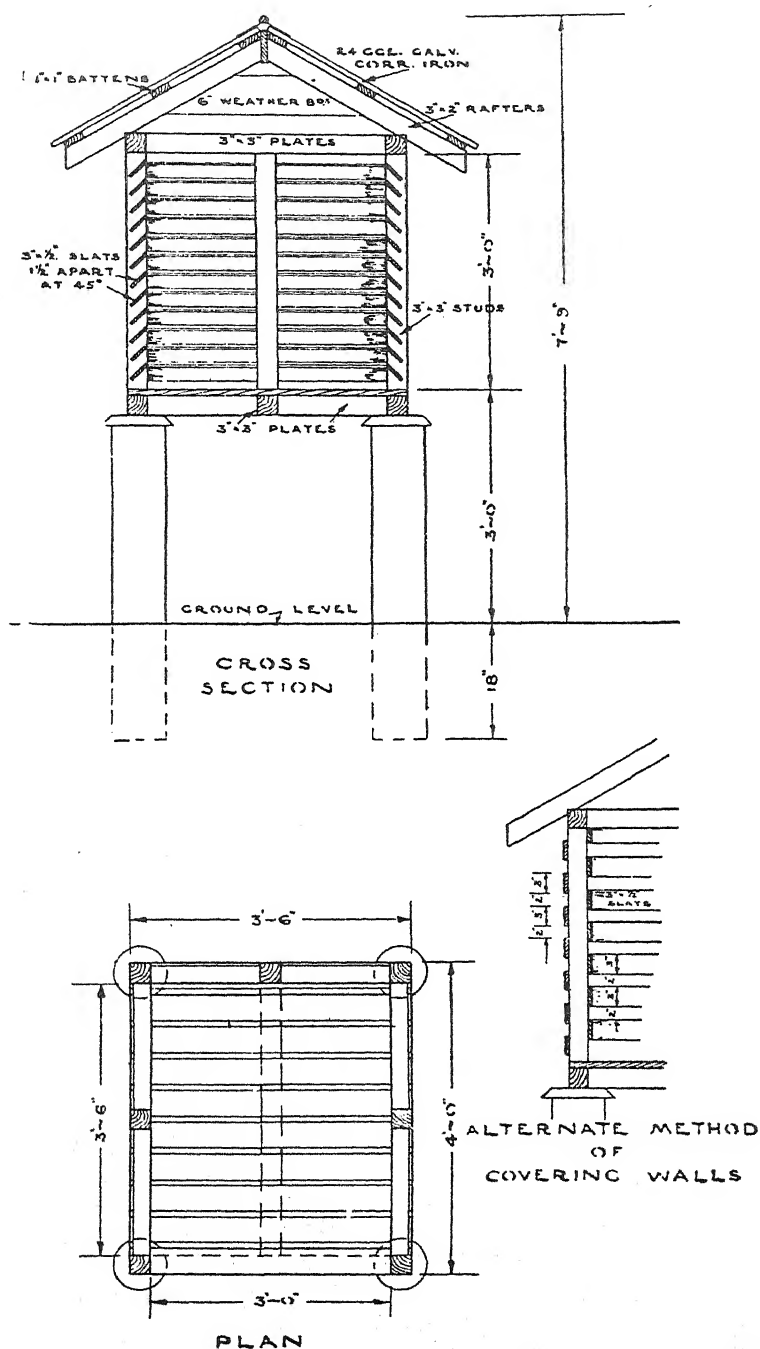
Plan and cross section of cream shelter illustrated in Fig. 24.
